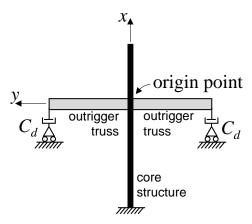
Cantilever column with damped outriggers (Chen et al., 2010)
